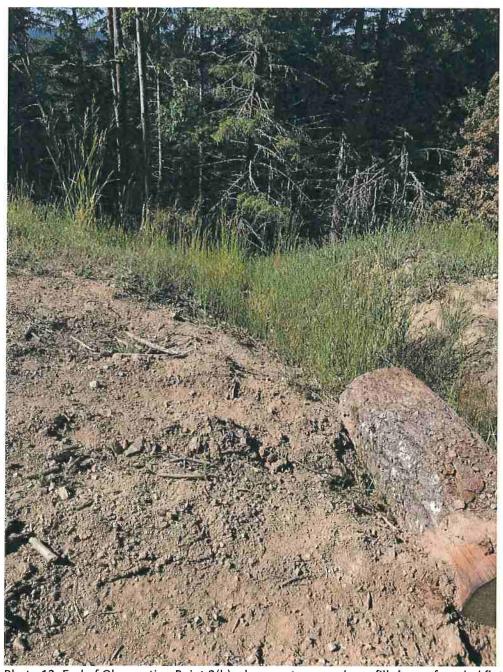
End of Observation Point 2(b) where water runs down fill slope of graded flat at Conversion Area #2.
